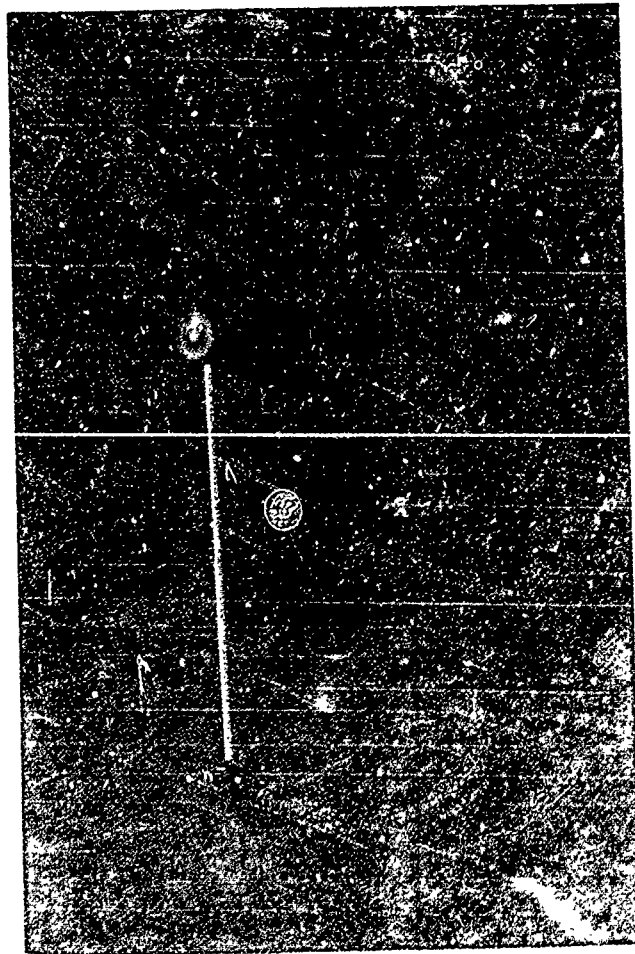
Cracking about Saw Cuts, Section 6 (Sawed).
